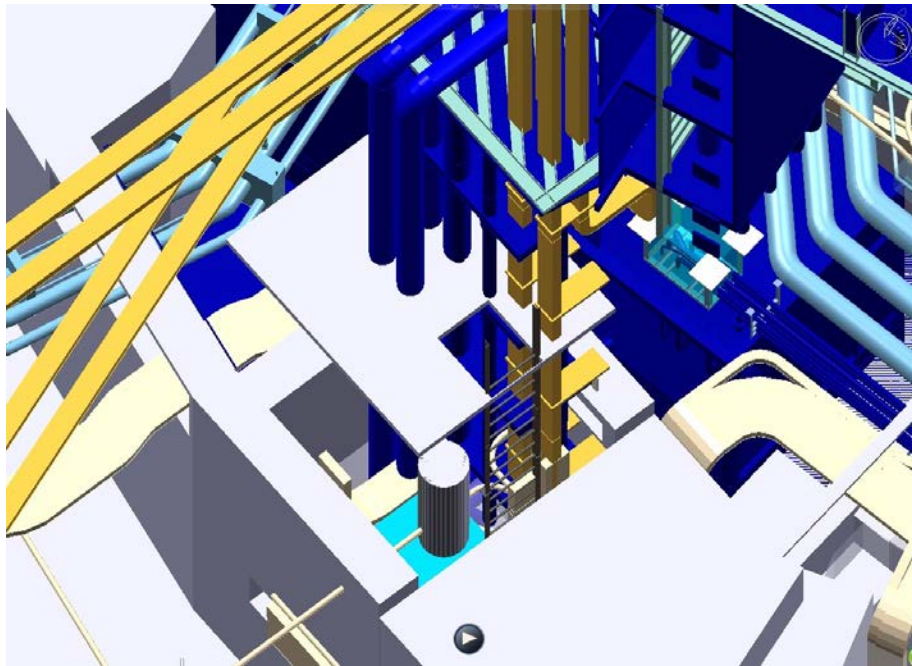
Details of TBS Connection Pipes and supports with the Shaft #18.
